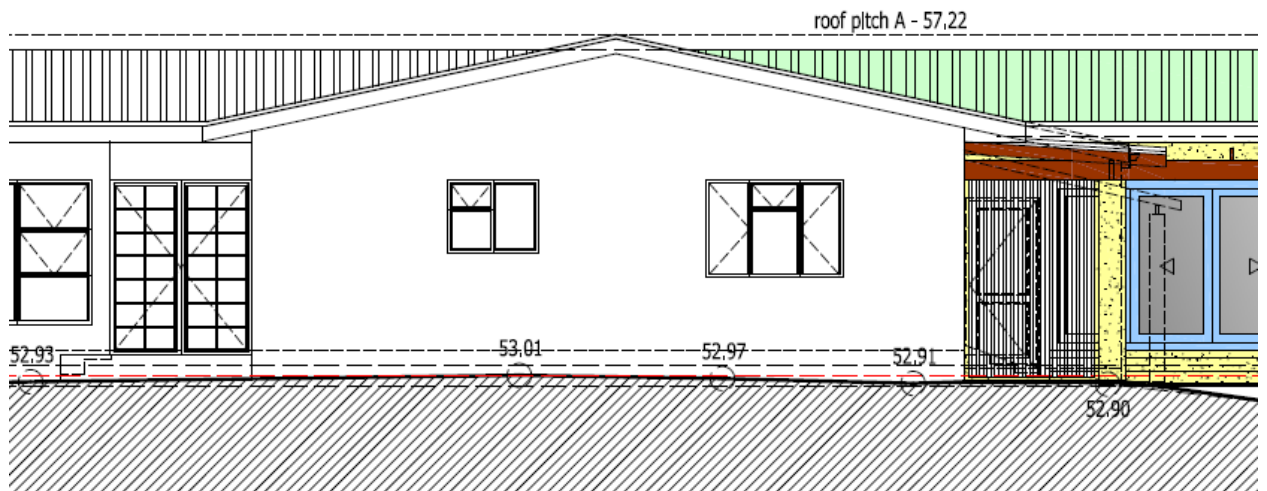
External elevation of eastern section of the dwelling ( existing windows to be replaced with obscured glass)
